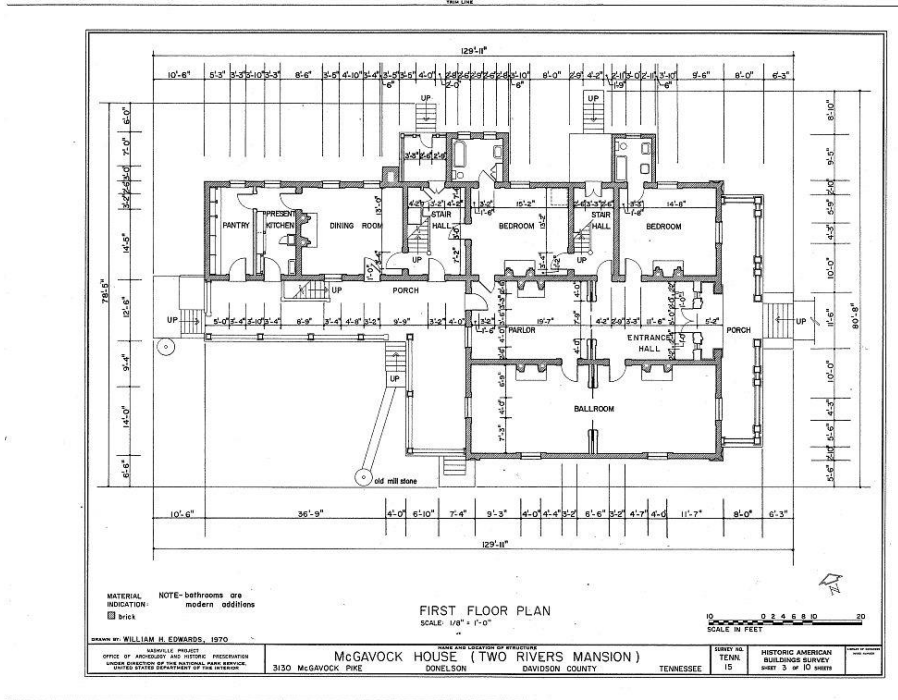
First floor schematic of the 1859 Mansion. Image from the Historic American Building Survey, 1972.
